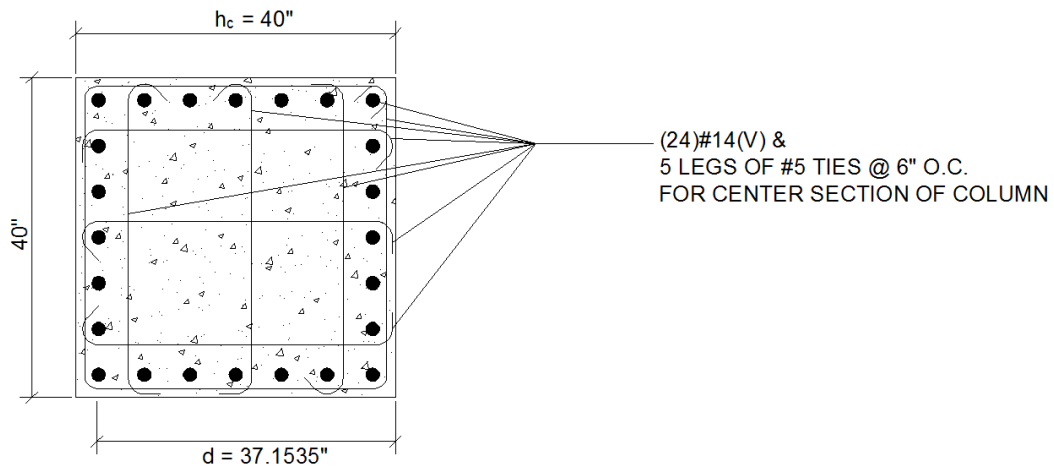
Exterior column, cross-section at center section of column at ground floor level based on tsunami design requirements.
